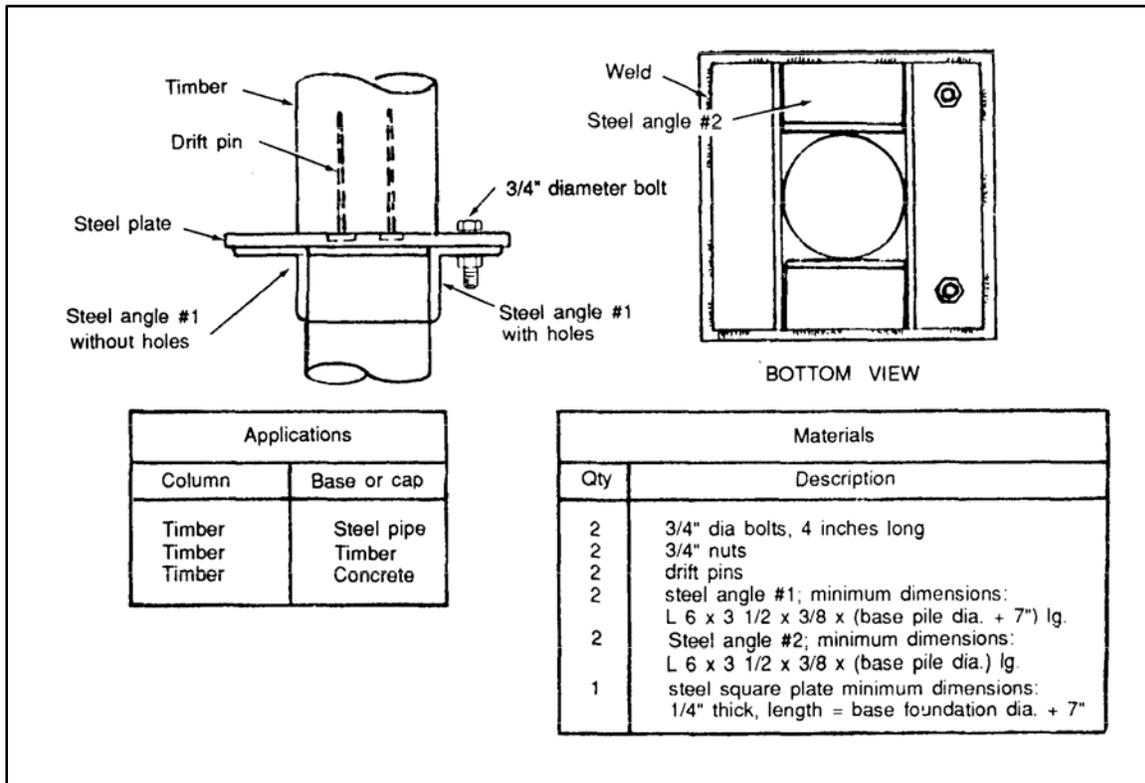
Joining piles of different diameter, column to base or cap connections (connecting method 4)
